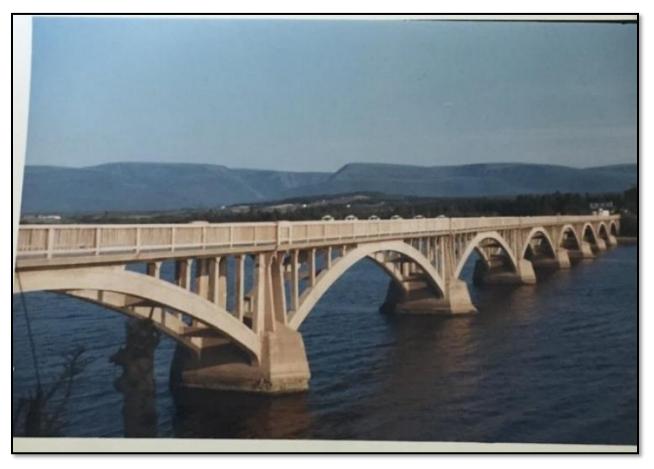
GRAND RIVER BRIDGE LOOKING TOWARDS UPPER FERRY IN 1966
